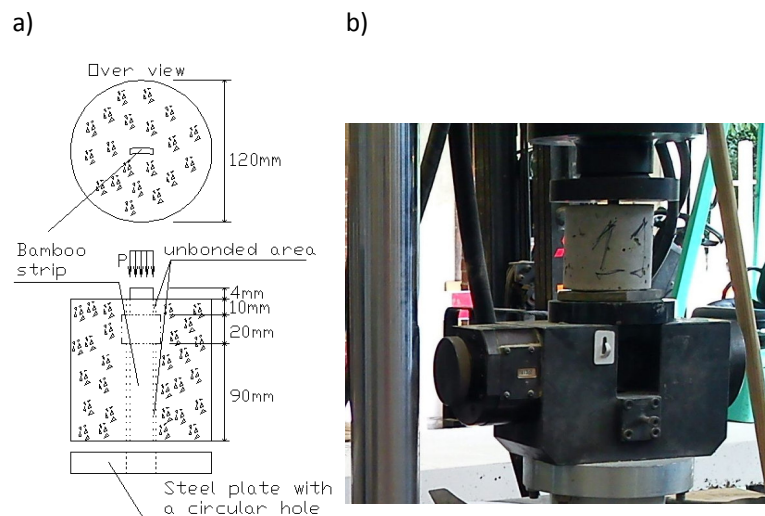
(a) Specimen's dimensions (b) Push-out test set up
